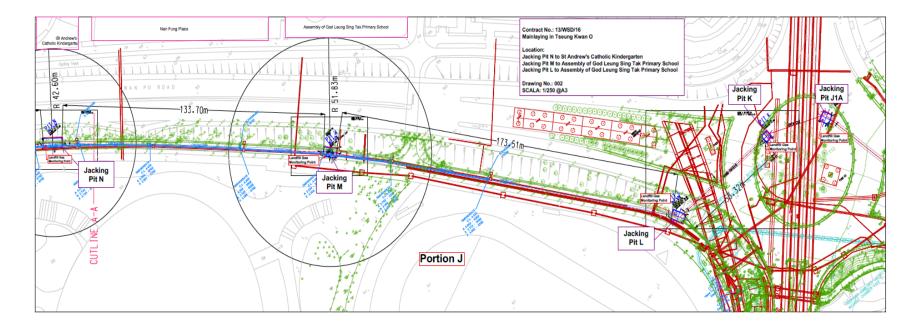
Location Plan for Portion J – Pit L-M-N, J1A, K
